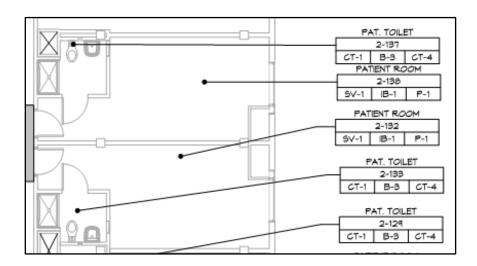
Floor Finish Plan Which Notes Flooring Types
